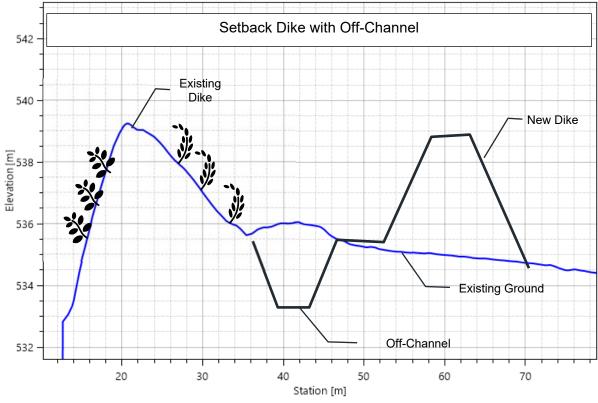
Typical Cross-Section of a Setback Dike – With Off-Channel
